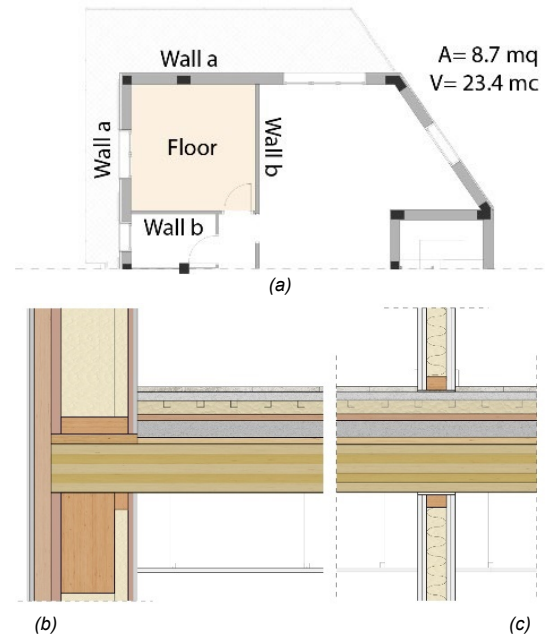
Distribution of the elements in the plan (a) and construction details: external wall type a – floor (b) and internal wall type b – floor (c)
